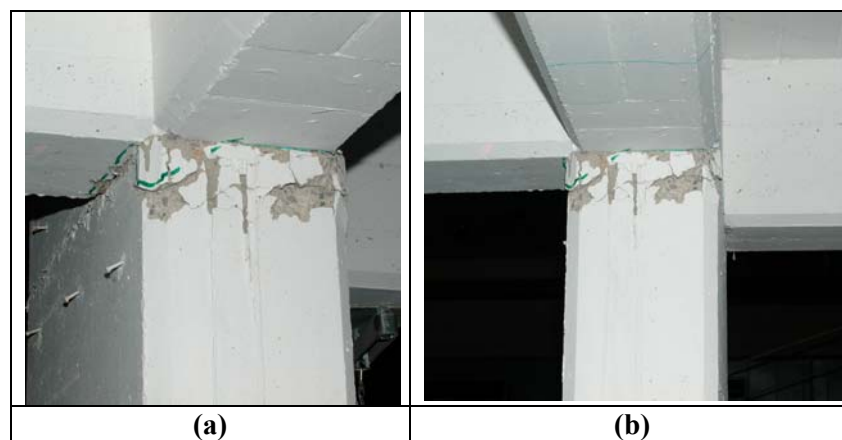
Damages on column C6 at 1st floor (a) and 2nd floor (b)
